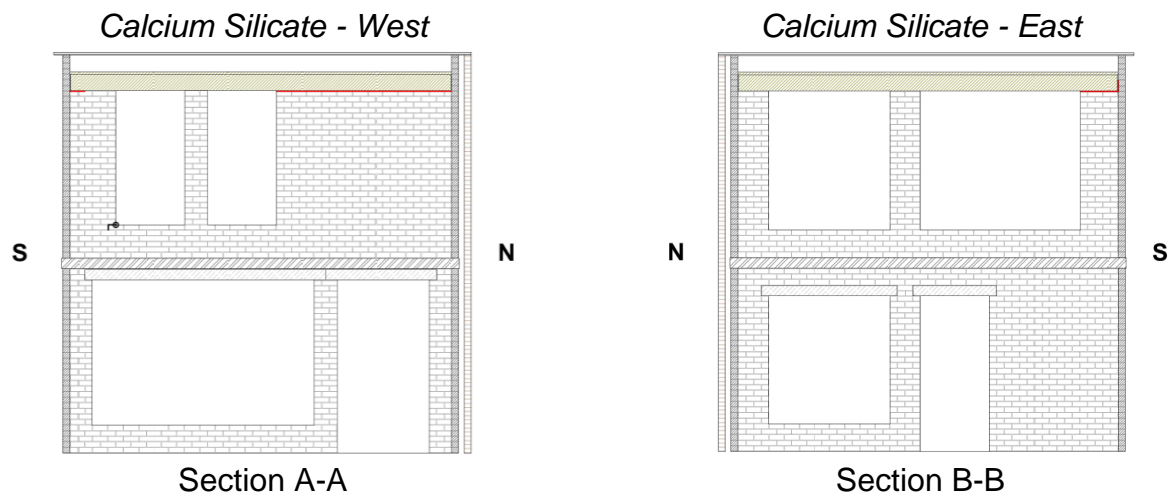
EQ-NPR 33% cracks - Calcium silicate longitudinal walls.
